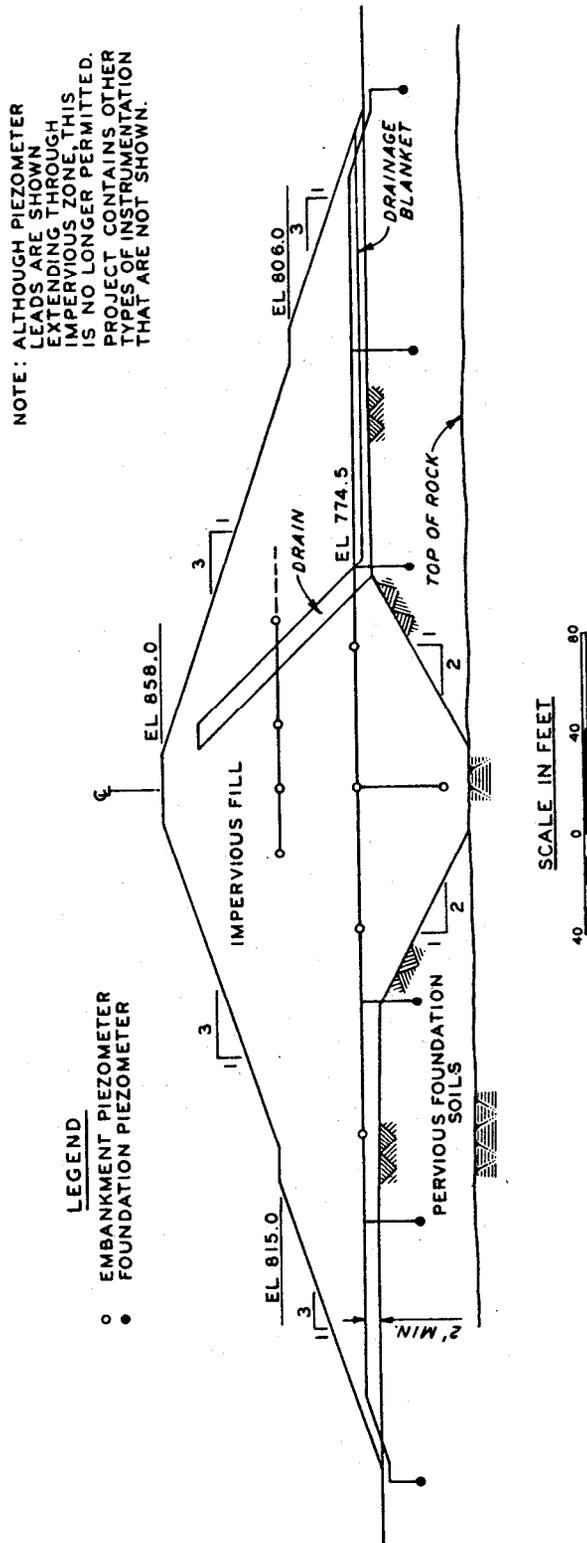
Piezometer installation for dams on pervious foundations, Deer Creek Dam (from EM 1110-2-1908)
